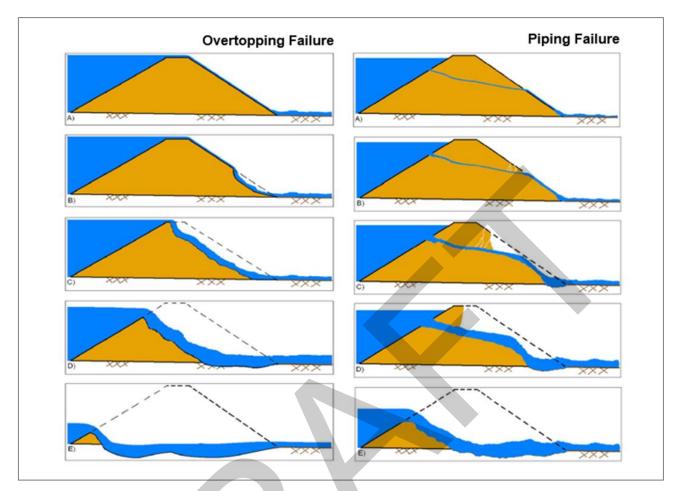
Overtopping and Piping Failure Configuration (US Army Corps of Engineers, 2014)
